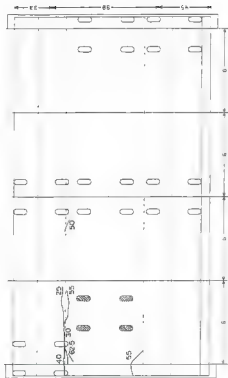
Top Cracking Pattern (Fifth Bridge - Test No 5)
